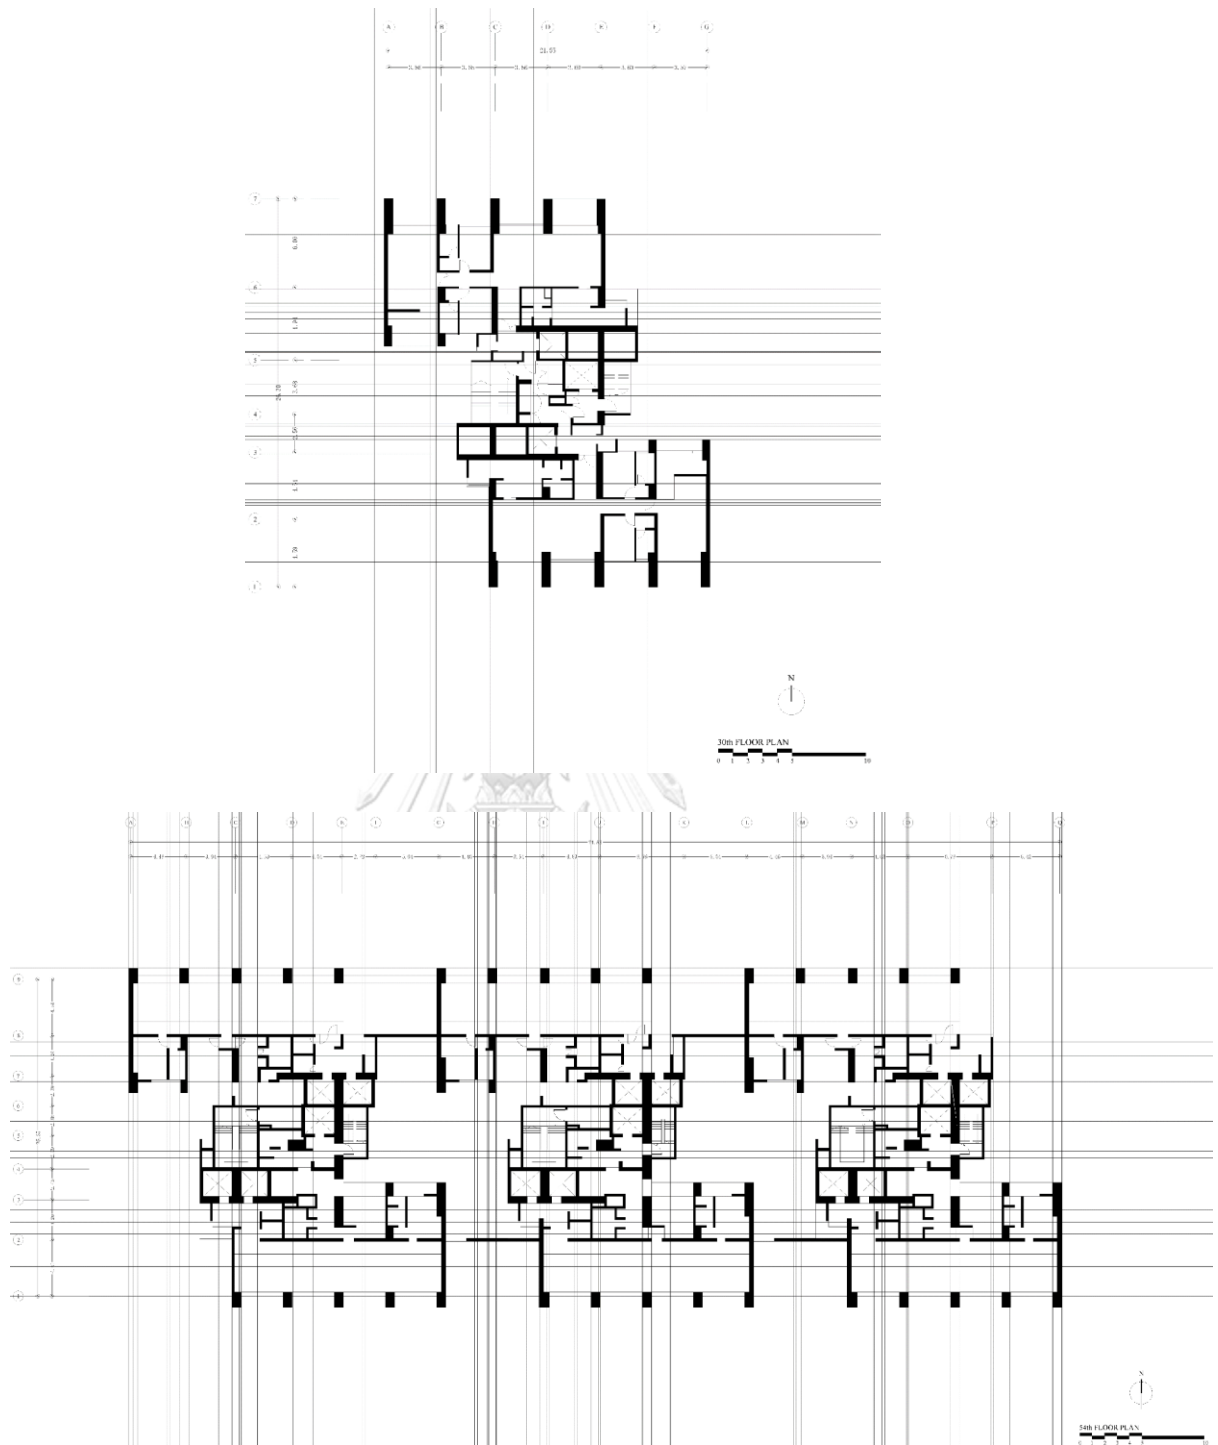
30th and 54th floor plan of *The MET Condominium*, redrawn by the author.
